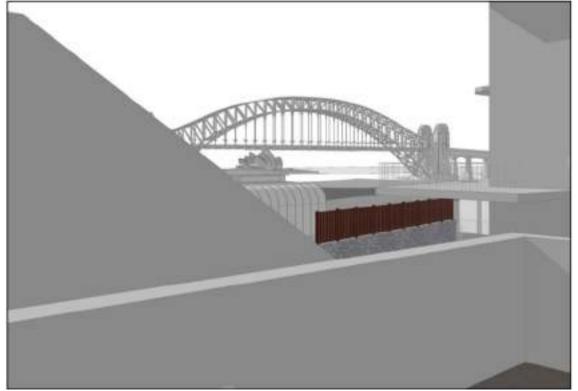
Proposed view from First Floor Bedroom External Deck at 1.6m eye level height.
